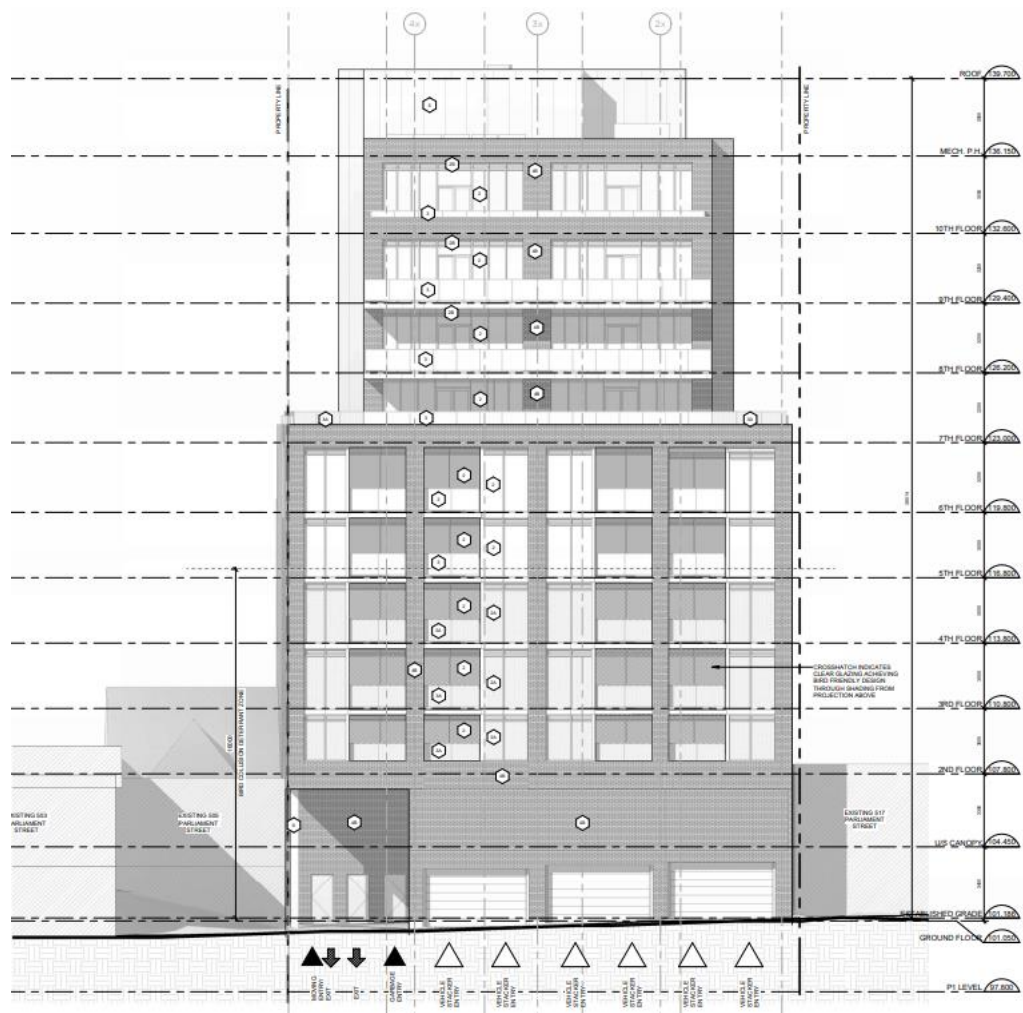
Proposed east elevation of 509 Parliament Street (RAW Architects Inc., 2025).
